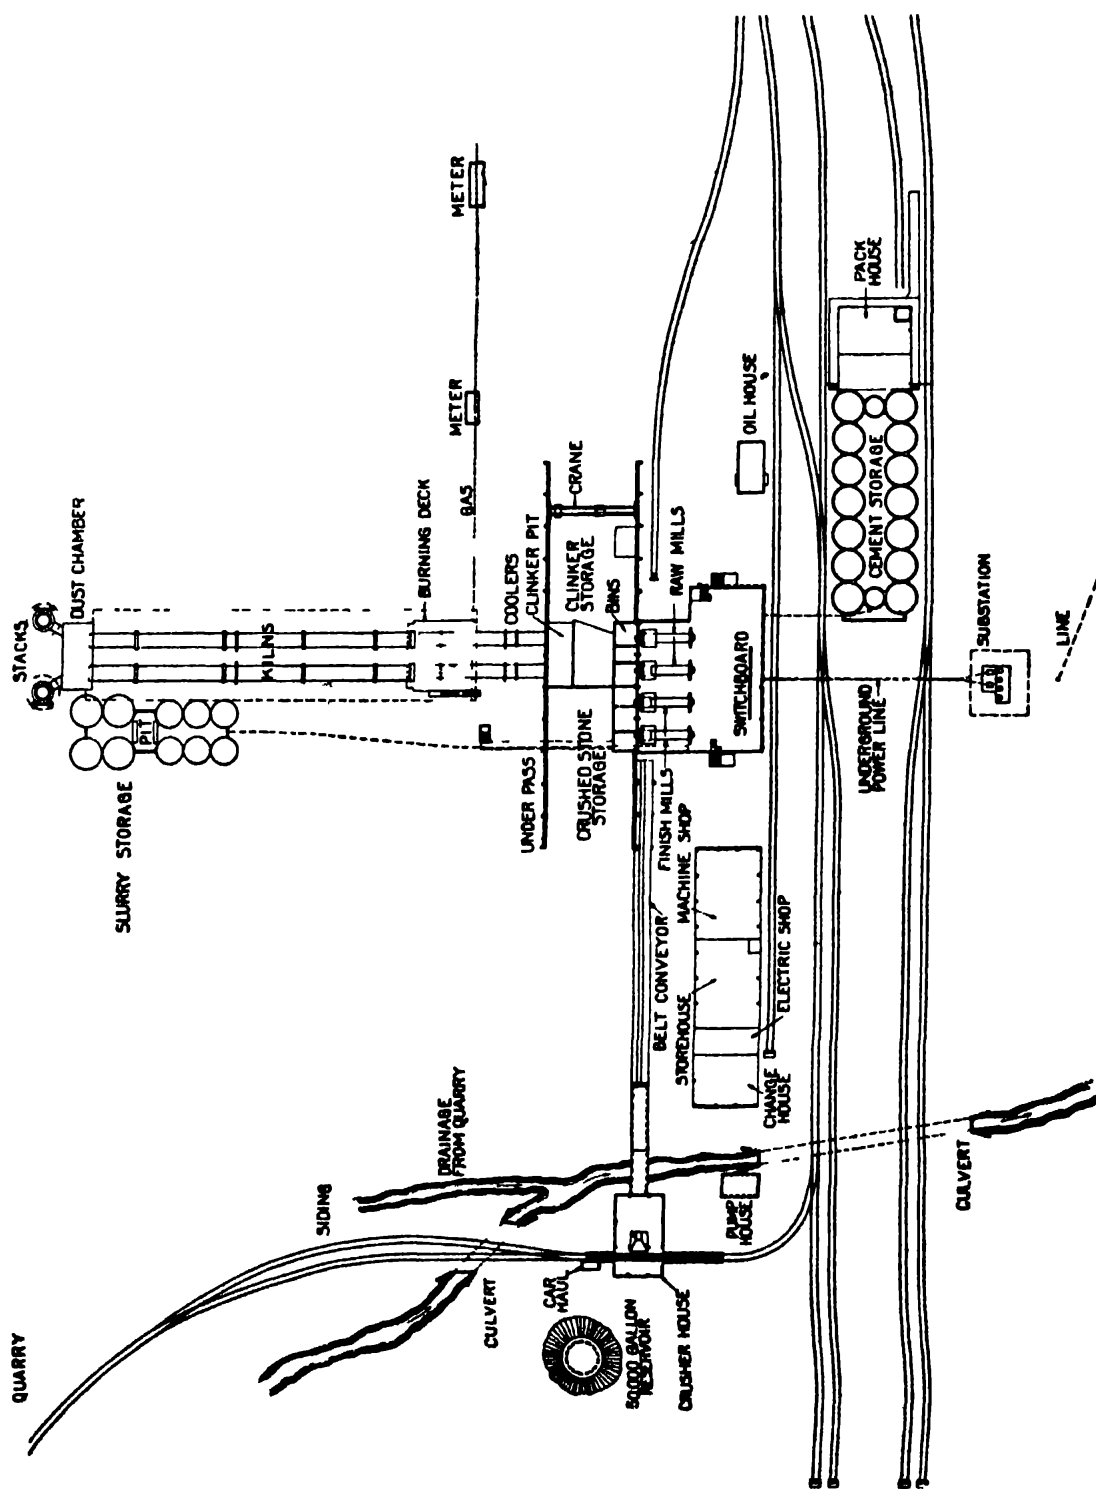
Ground Plan of the Republic Portland Cement Co.'s Plant.
